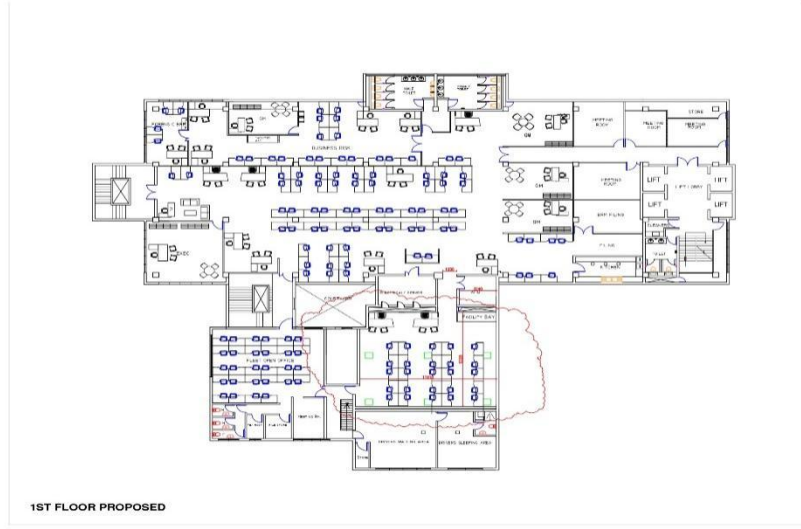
MTN PLAZA Office 1st Floor Plan
